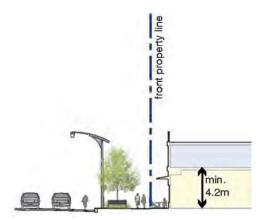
Buildings in the Community Core with retail at-grade should have a minimum ground floor height of 4.2m.
